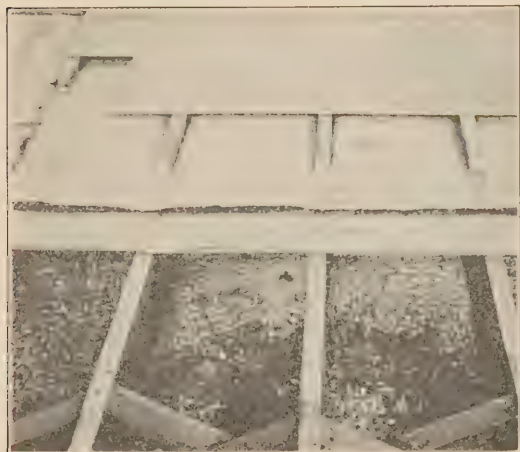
View of Floor and Ceiling Construction Subjected to 75-minute Exposure to Standard Fire Endurance Test. This photograph shows arrangement of parts comprising the construction.
